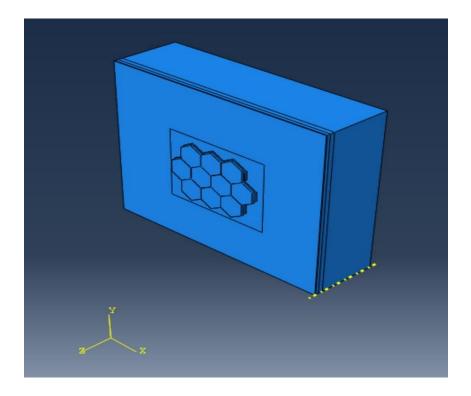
Interlocking Concrete Pavement model in assembly module
